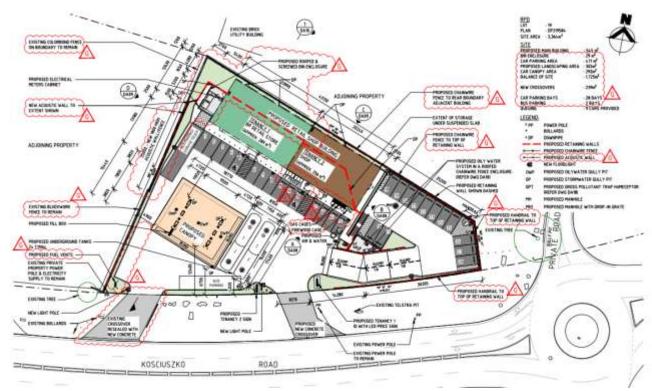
Proposed site layout plan (with amendments to original plan shown in red clouds), a full size set of plans are attached to this report.
